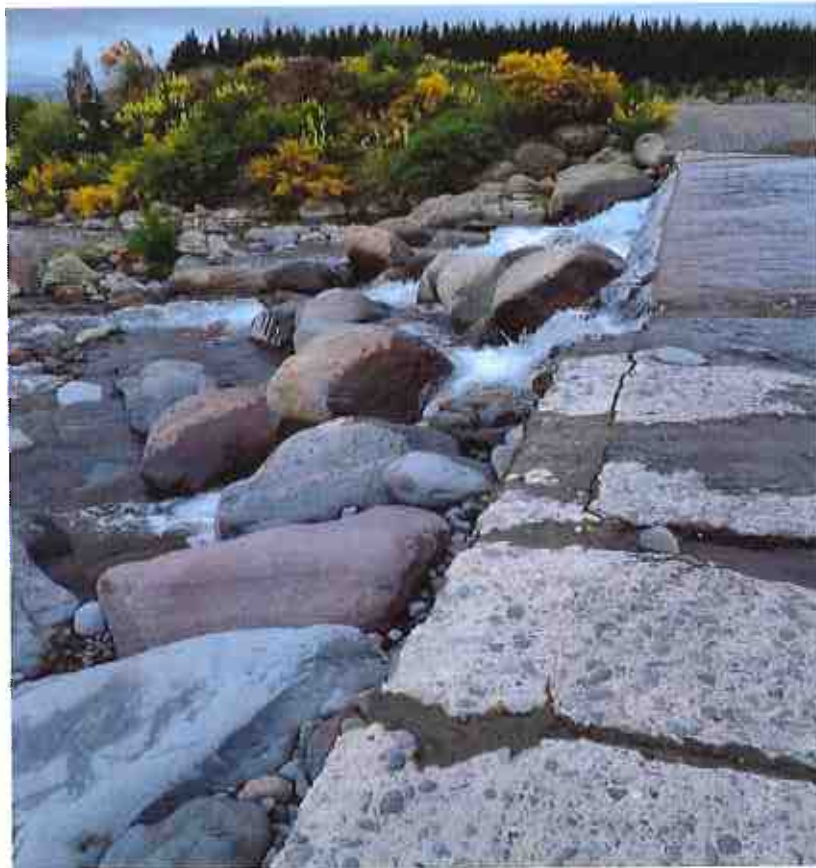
Wāhianoa River Main Road ford (W₂) showing downstream face, 4 December 2024.
